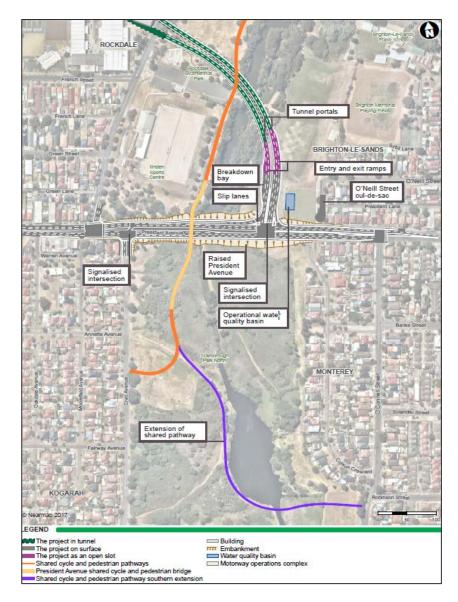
| Proposed President Avenue intersection layout (Source: PIR)
